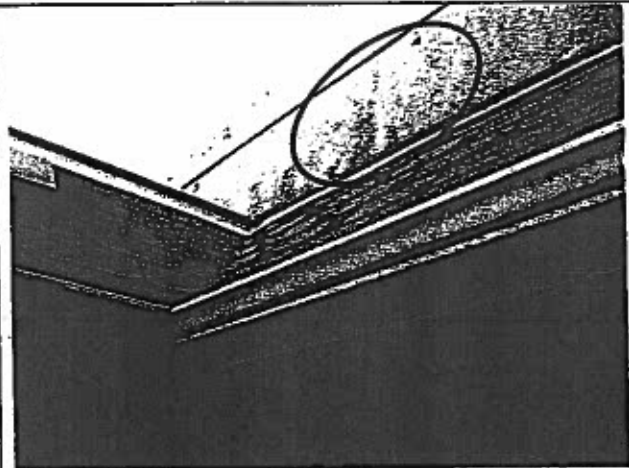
Heavy water staining on stucco. Stucco could be saturated and affect the wall structure behind.
